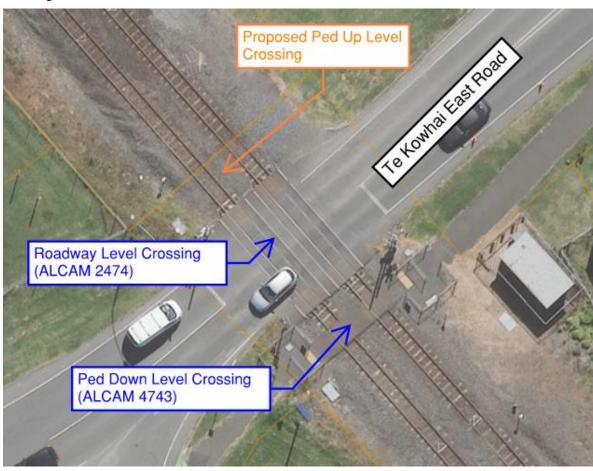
Existing Layout of Te Kowhai East Road Rail Crossing
